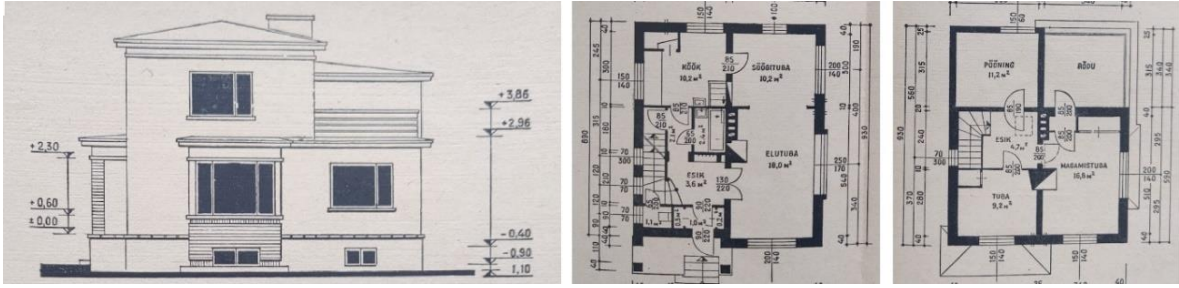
Project E-34, an early example of a partly two-floored dwelling (left to right: elevation; ground floor; upper floor) (ENSV MN Riiklik Ehituse ja Arhitektuuri Komitee, 1959)
